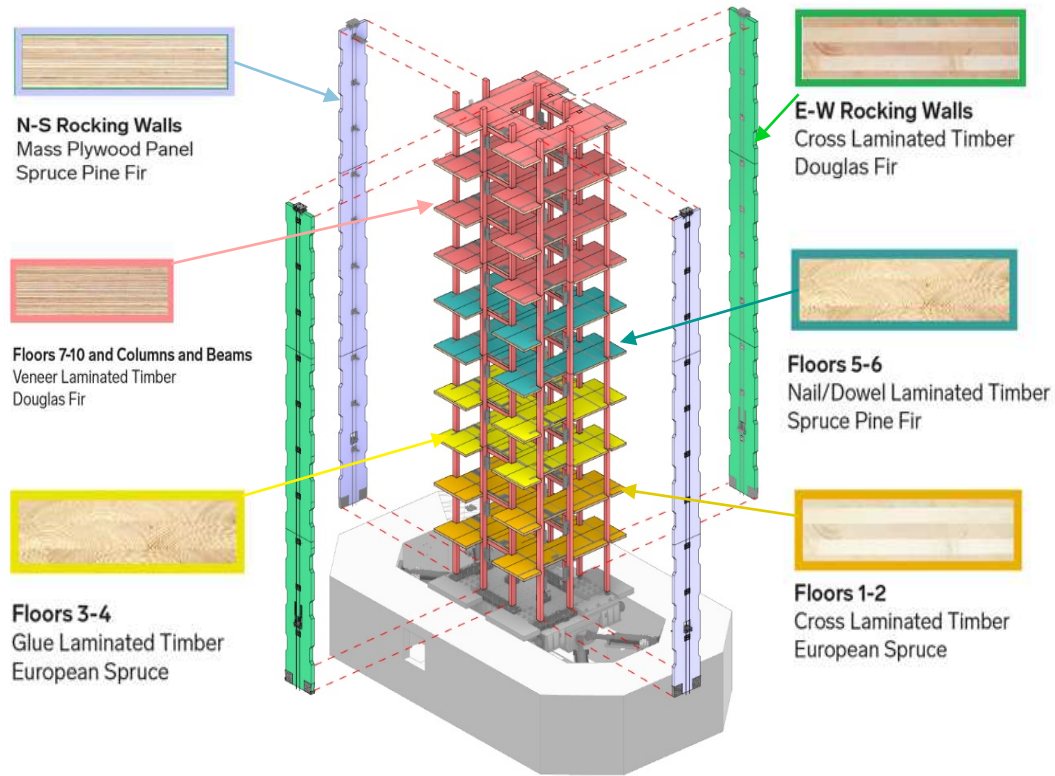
Mass Timber Structural Element Detail (Graphic Courtesy of LEVER Architecture)
